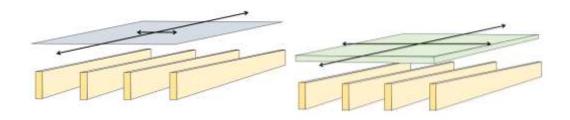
Floor configuration, reference floor and floor with concrete screed. To the left is an illustration of the reference floor, to the right is a floor similar floor, but with added concrete screed. The transversal stiffness is higher in the floor with added screed.
